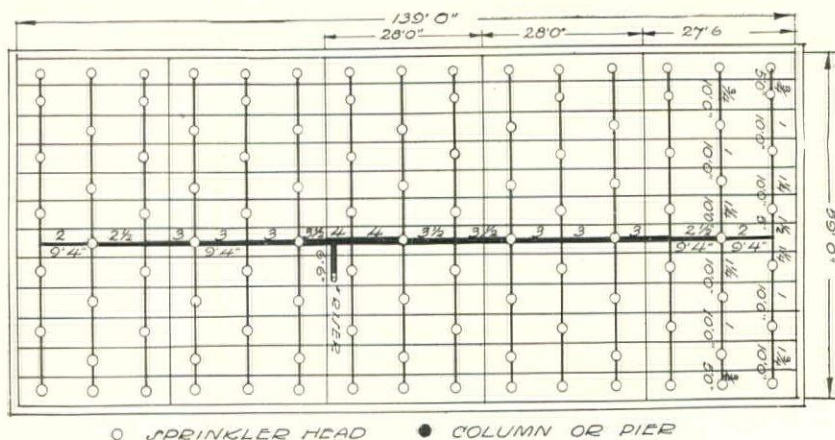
Sprinklers under Semi-Mill Construction in Alternate Bays
